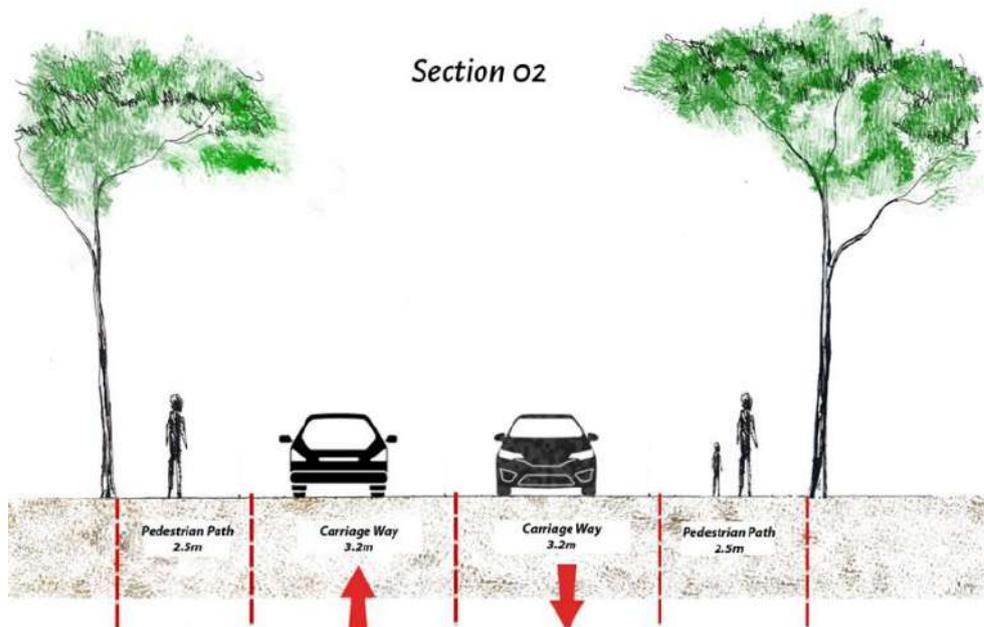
Proposed cross-section of the Arugam Bay Main Street as a pedestrian dominated street
